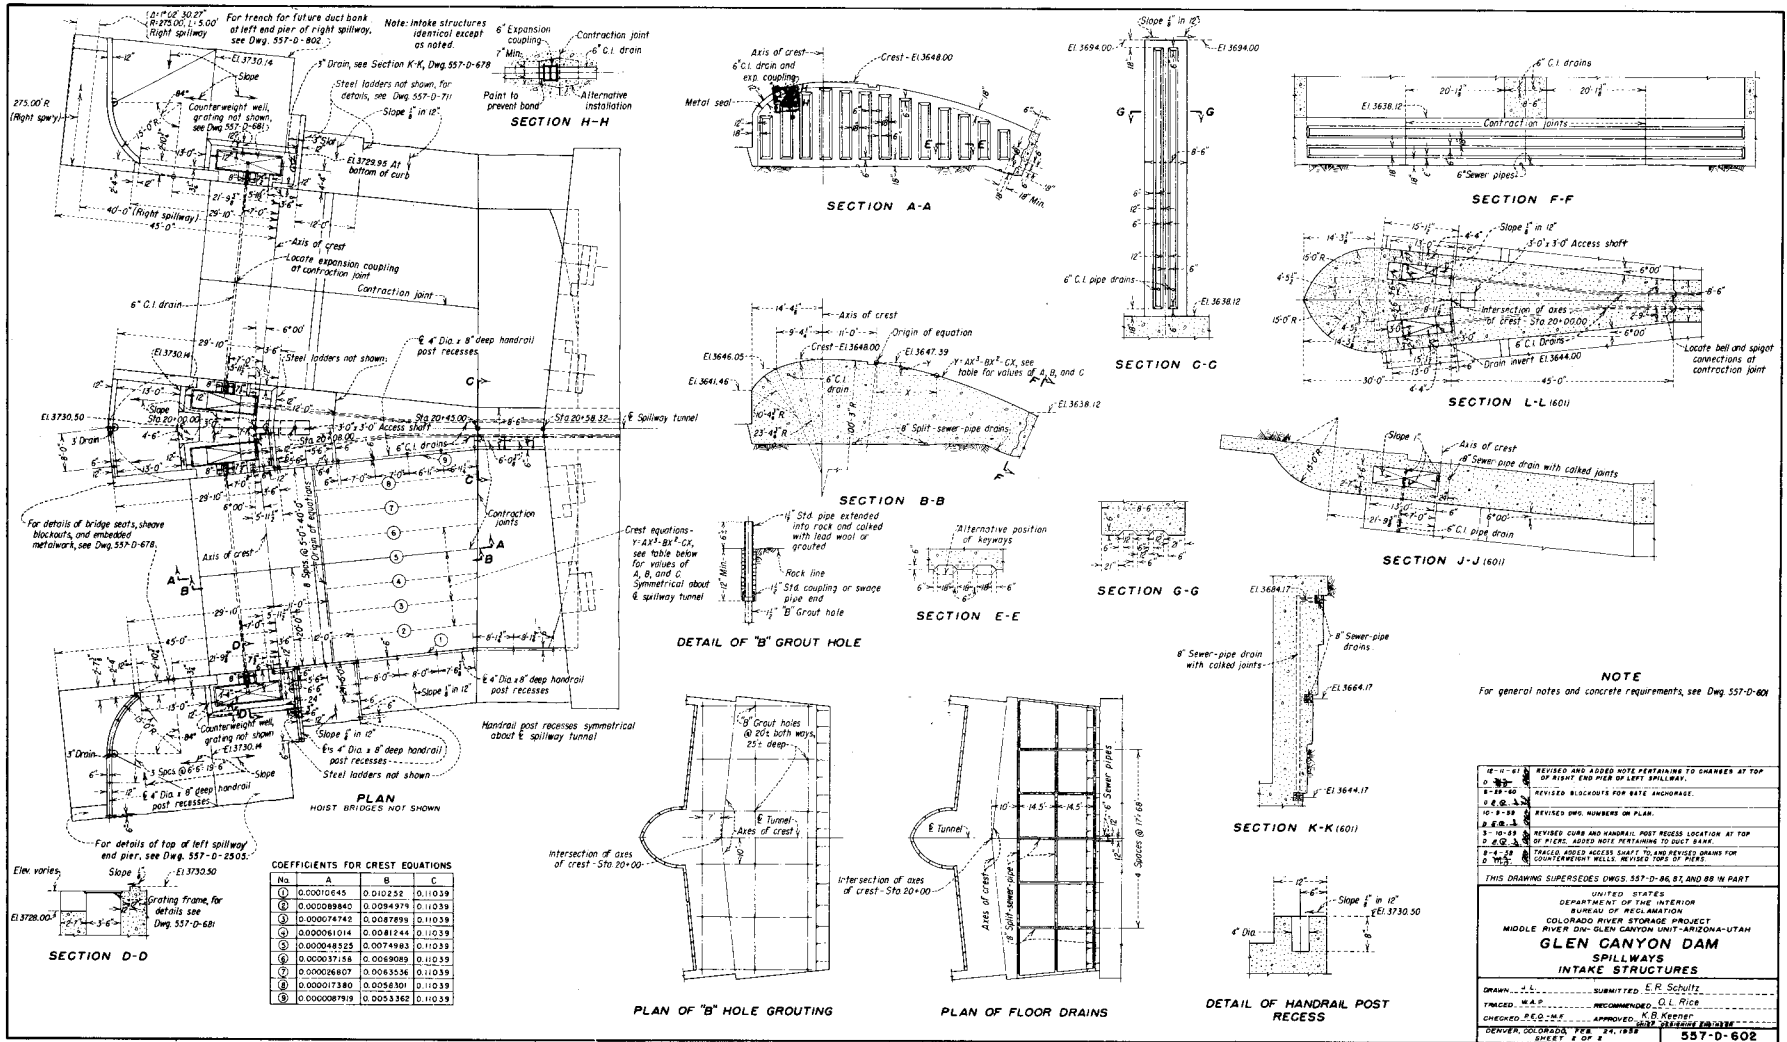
Spillways intake structures. (Sheet 2 of 2.)
